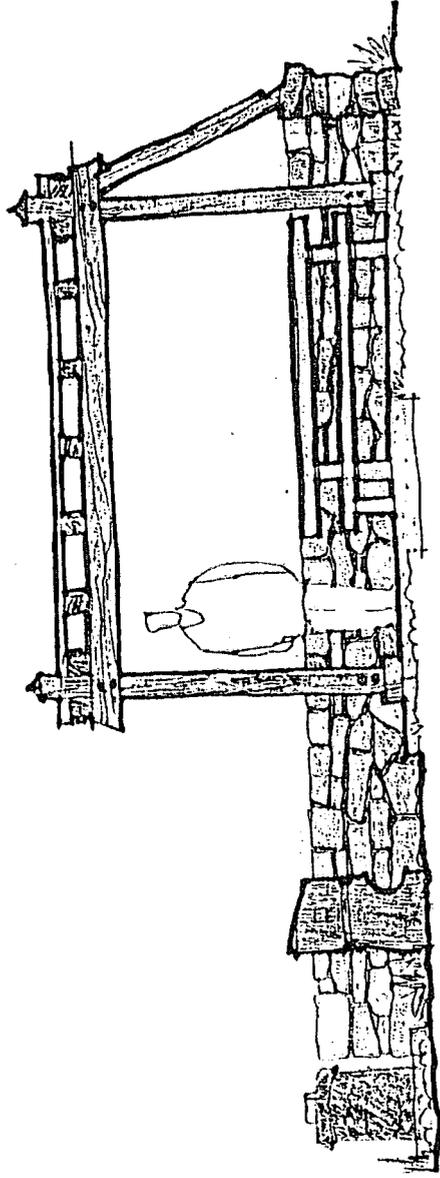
Plan View of the Proposed Picnic Ramadas at Goat Camp Ruins
